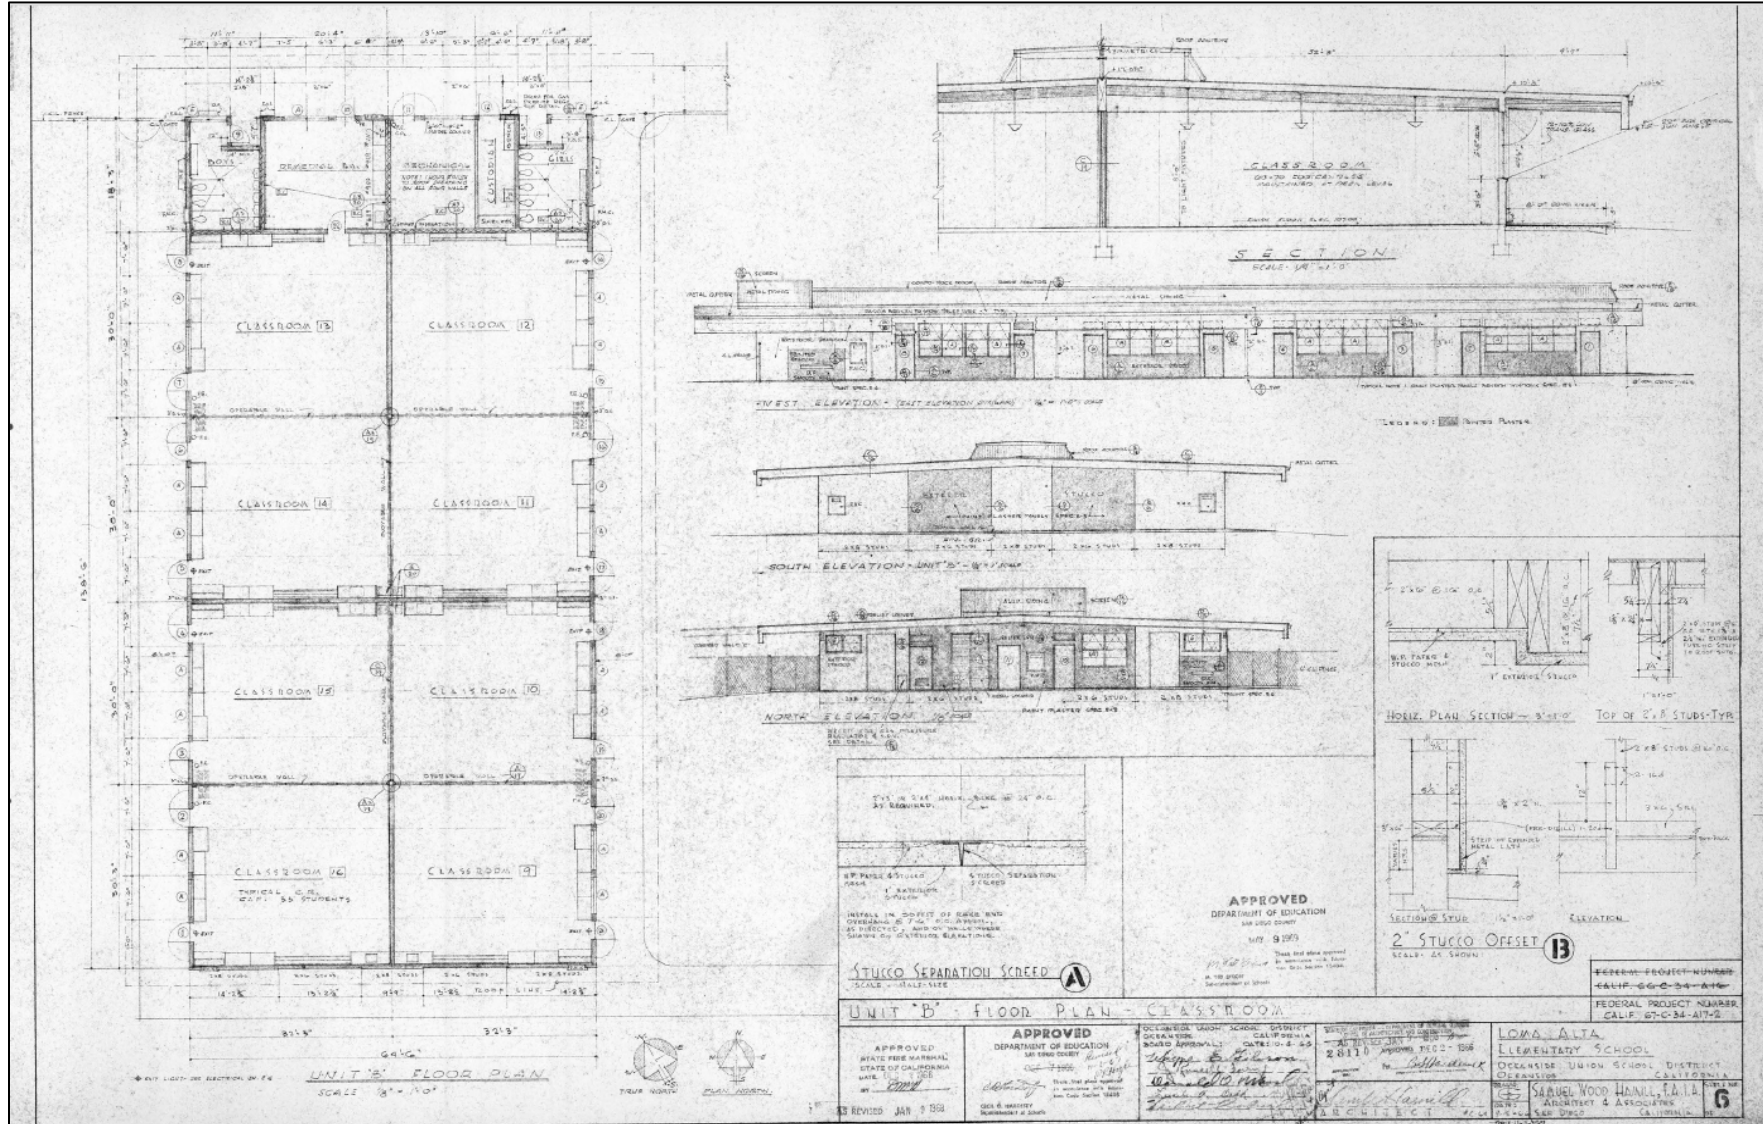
1966 Unit B Floor Plan and Elevation Drawing, Sheet 6. Source: San Diego History Center.
